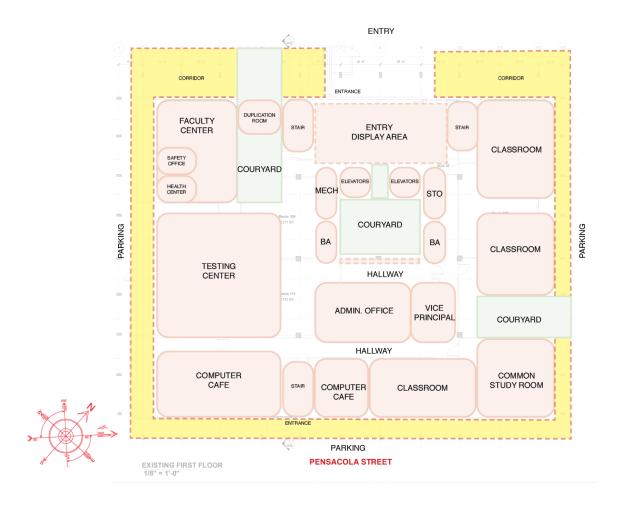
NEW PROGRAMMING BUBBLE DIAGRAM OF THE FIRST FLOOR
